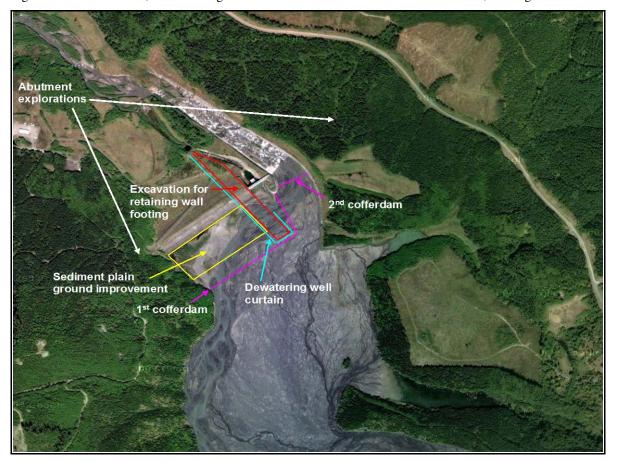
Earthwork, Dewatering and Cofferdams for SRS Raised 160 feet, Configuration 1
